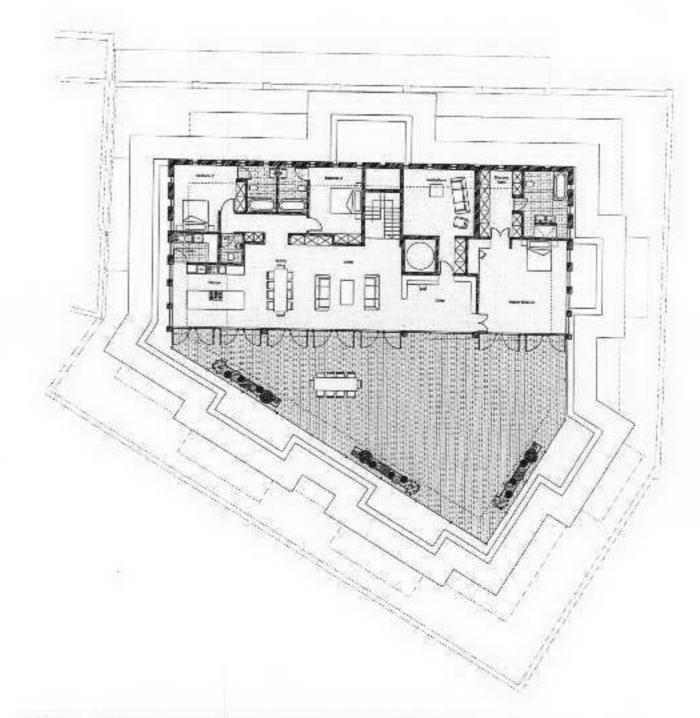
Fifth Floor layout showing 1no. 3 bedroom apartment (yellow) and large roof terrace.
